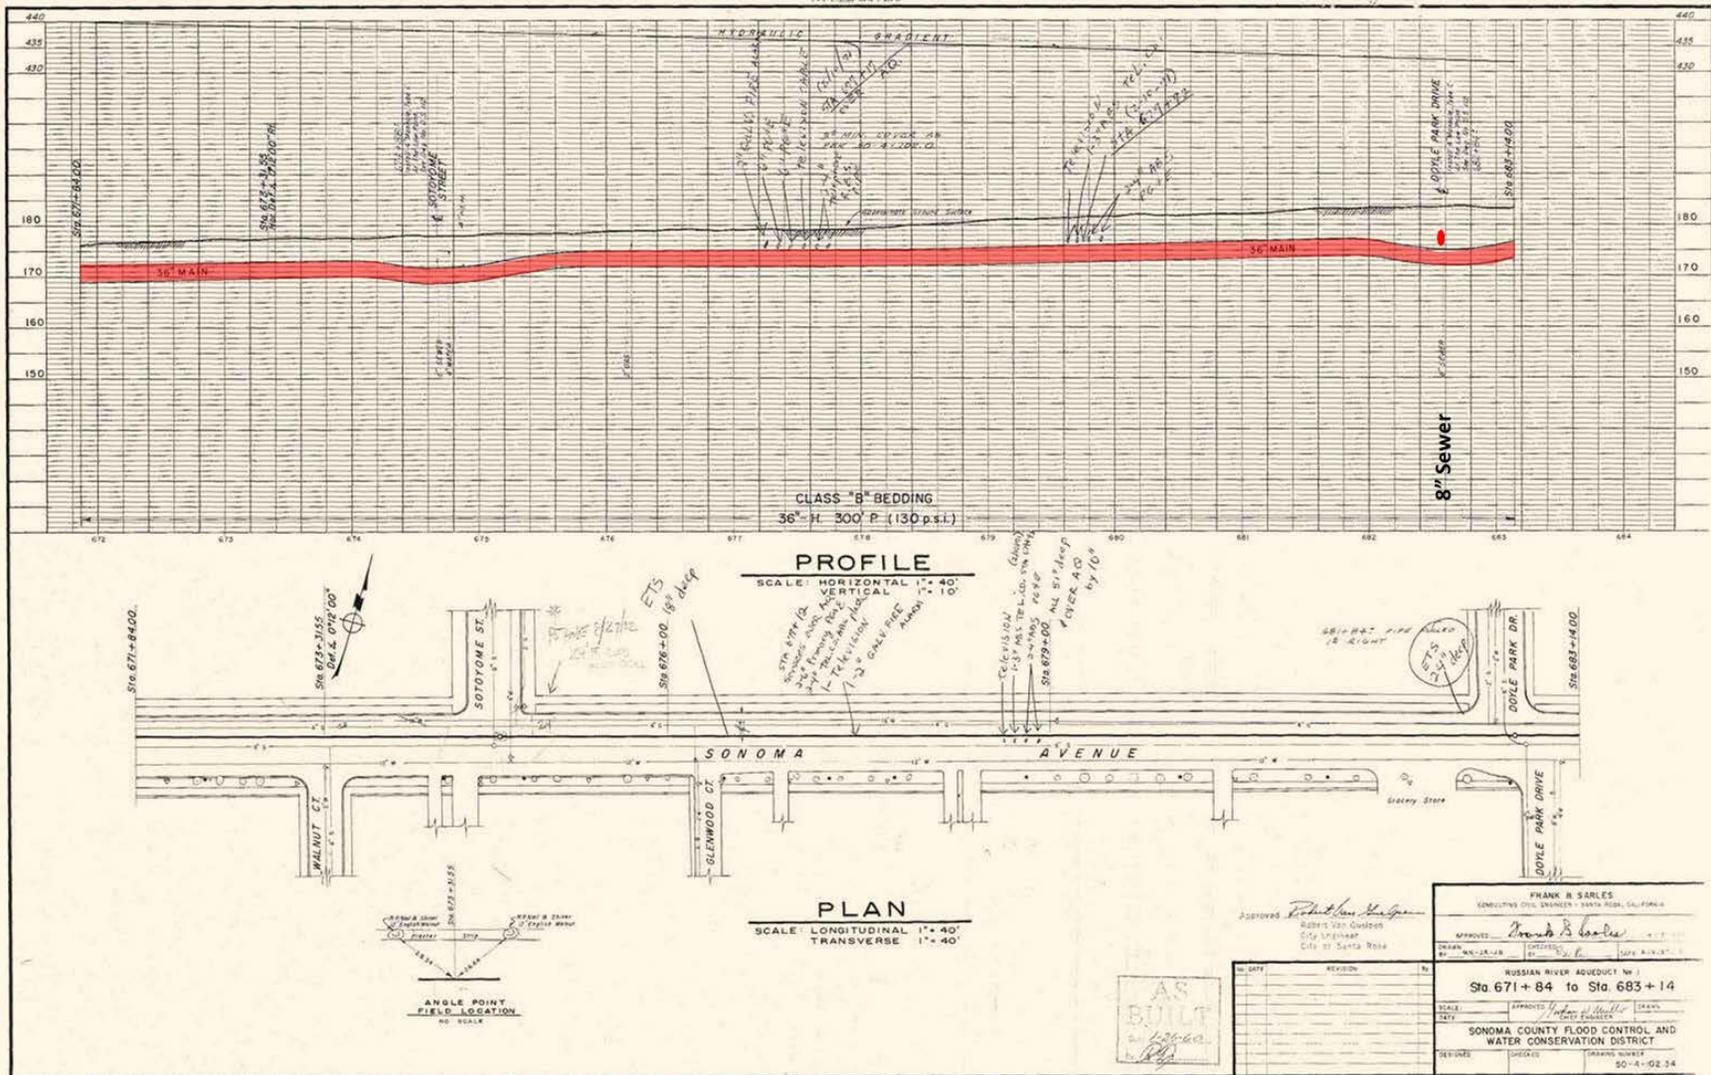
Plan and Profile of Existing Pipeline (1 of 3)
